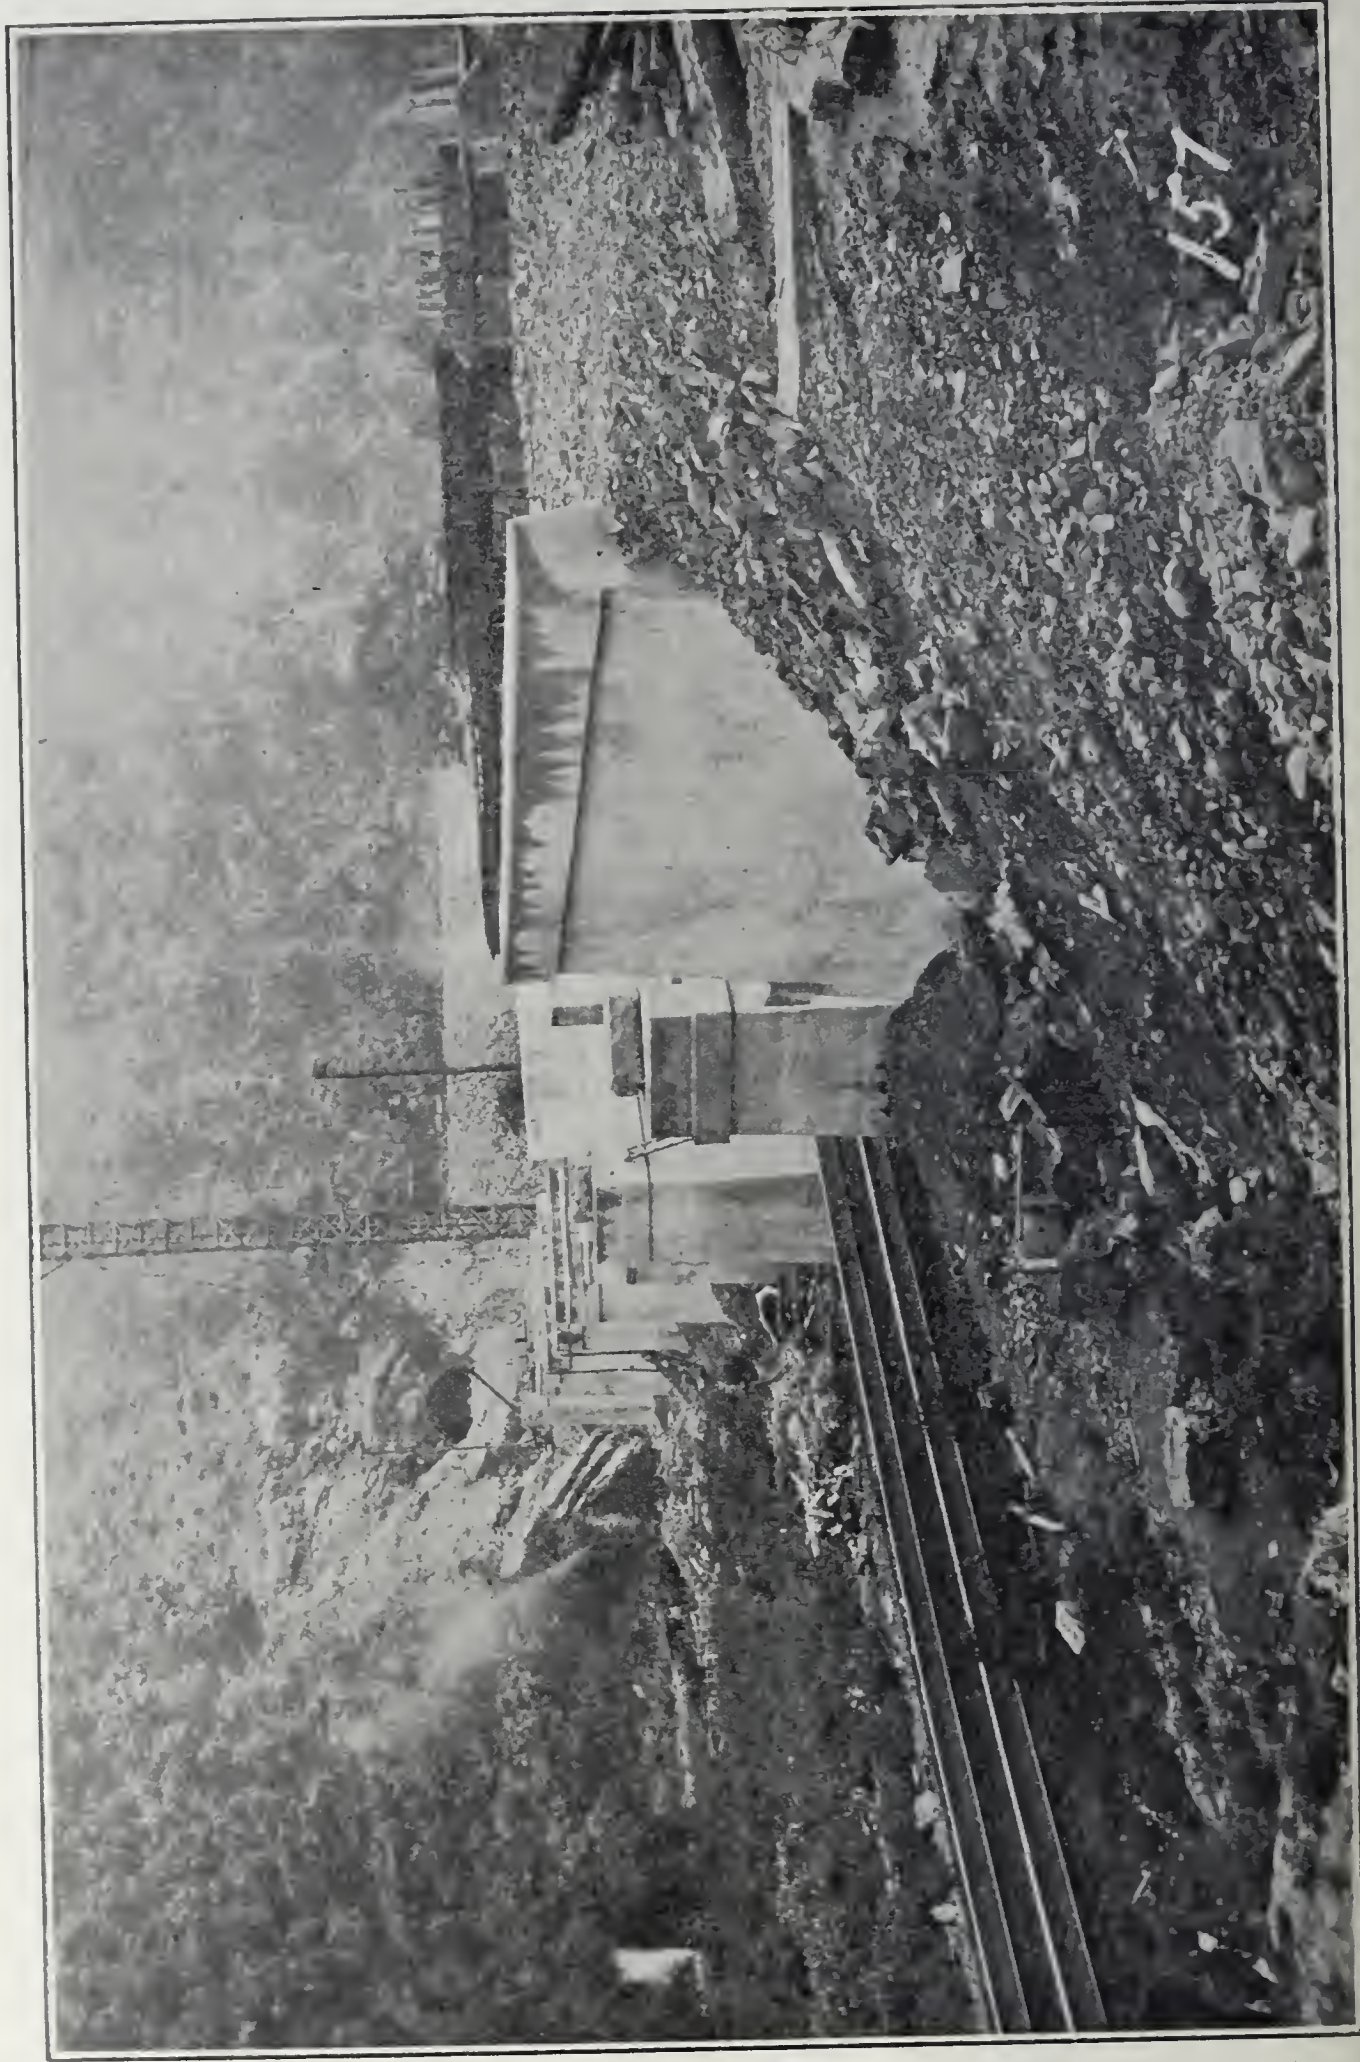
Kessler's Bridge, Looking Toward West Portal of Graham Tunnel.
